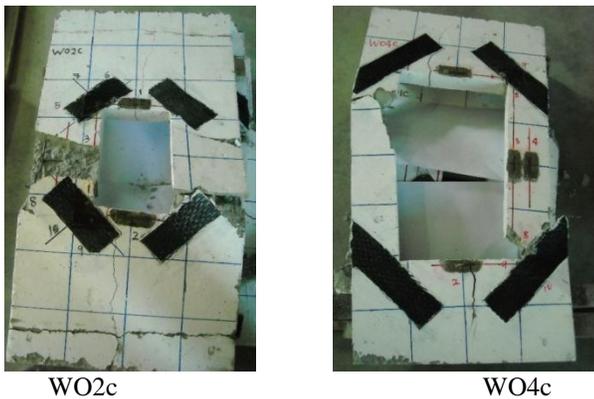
Crack patterns on the tension face after failure of the 40mm thick wall panels with openings strengthened with CFRP pattern 2.
